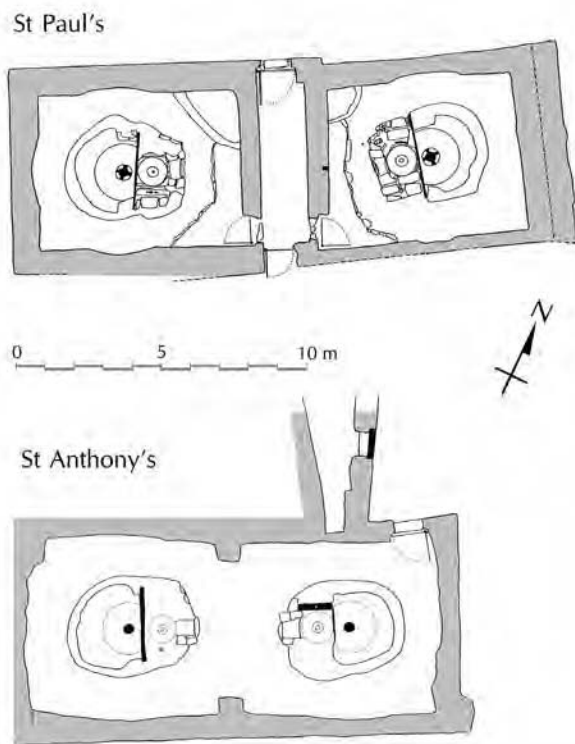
Plans of the mill buildings at Saint Paul's Monastery and Saint Anthony's Monastery. Drawings by Angela Milward Jones and the author.
